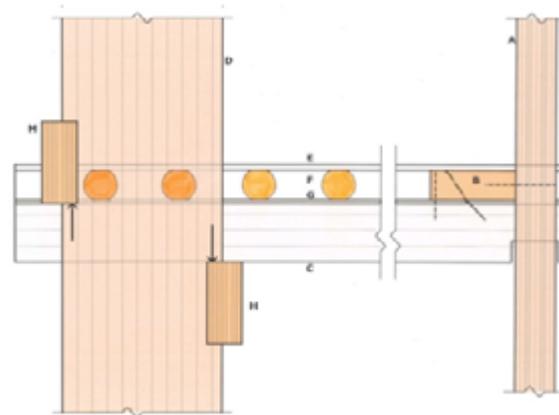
Floor Beam Elevation (section z on Figure 3), A - core wall, B - ‘hoop’ beam (Screw fixings to core and floor beams are indicated), C - engineered timber floor beam, D - engineered timber column, E - flooring, F - pole floor joists, G - ceiling, H - corbels to transmit beam moments to the column
